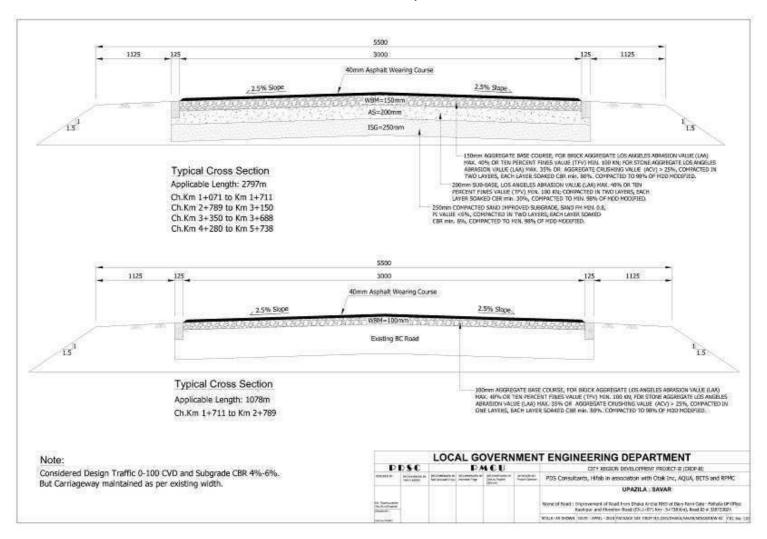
Cross section of Road-3: Prantik bazar BLRI – Ashulia UP Road (Ch.0- 5510m) (Road ID: 326723017)
